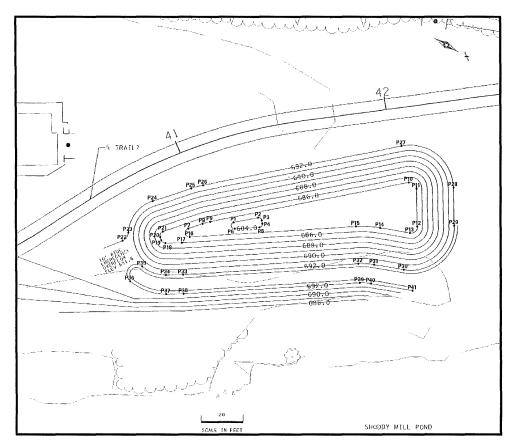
PRE-CONSTRUCTION PLAN OF THE SHODDY MILL POND
